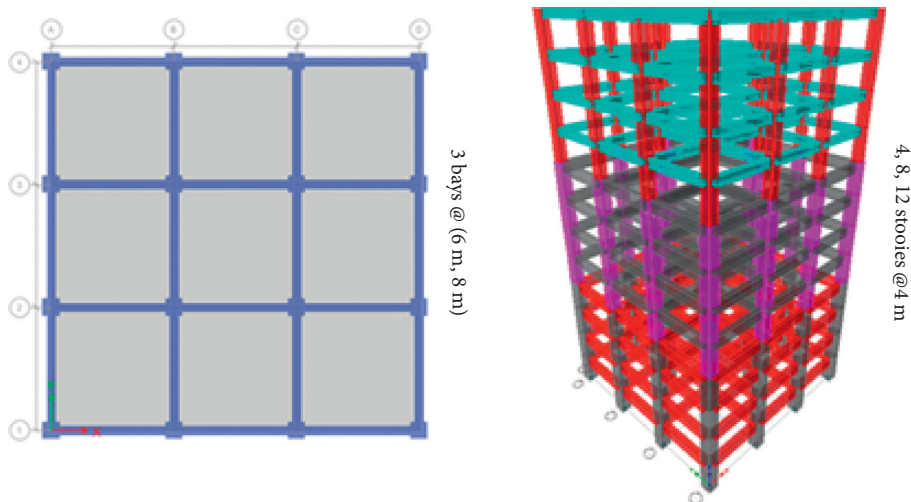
Plan and elevation of the reinforced concrete buildings.
